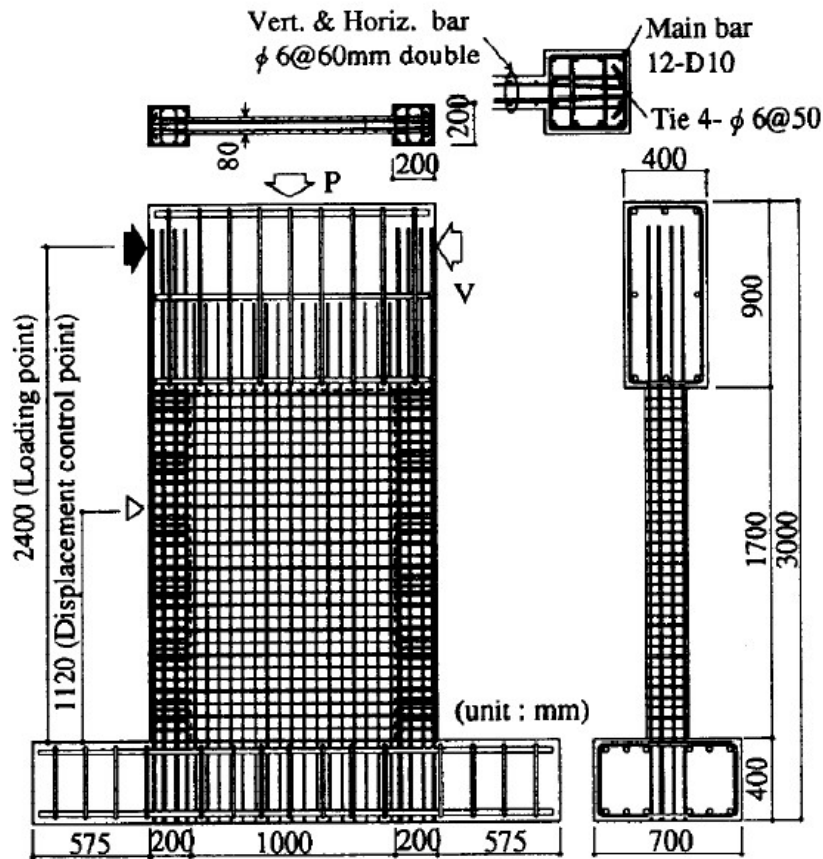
Typical details of walls tested by Kimura and Sugano (1996)
